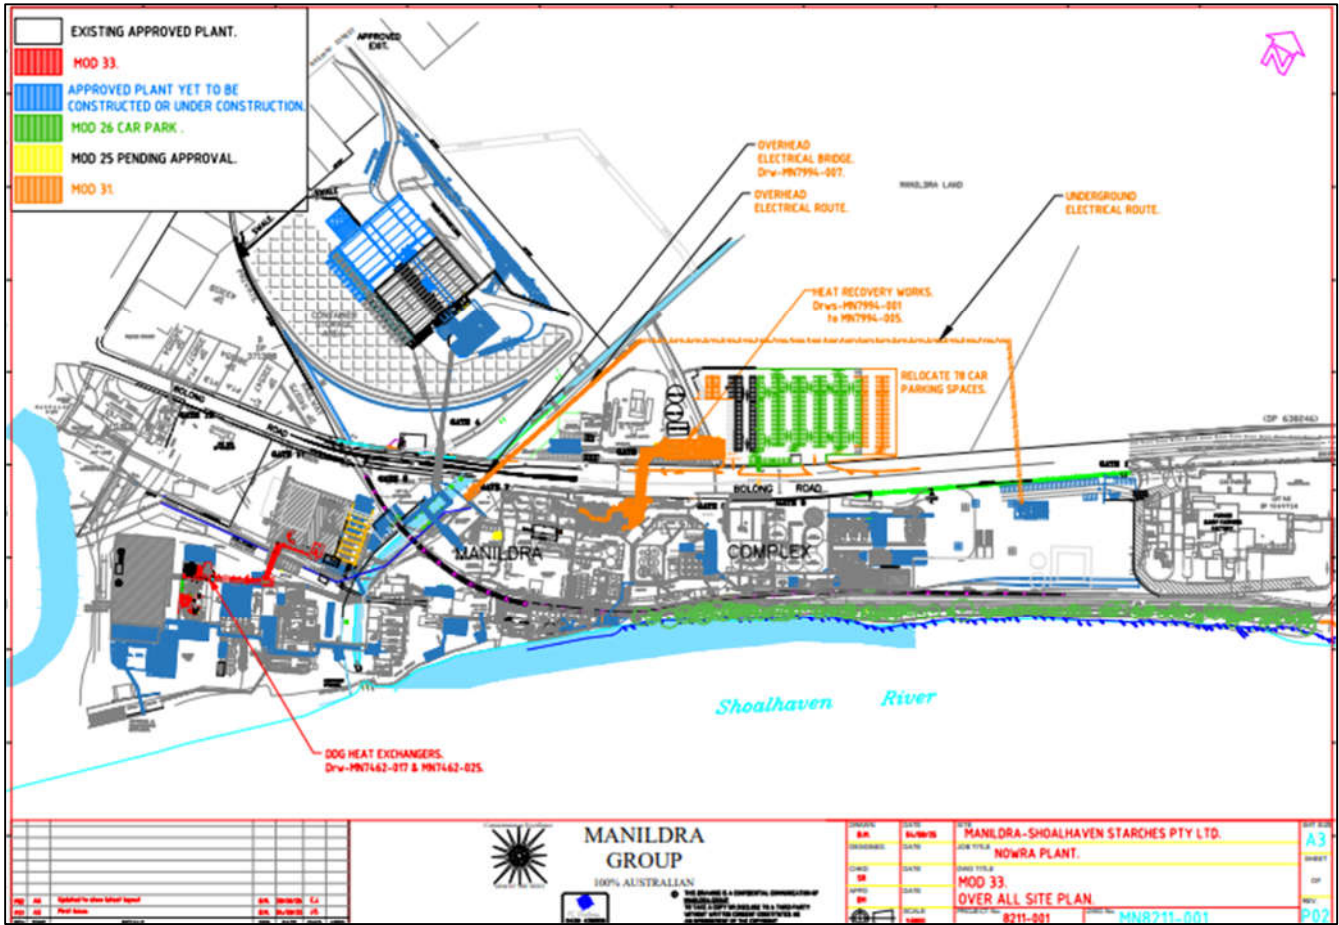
Modification Proposal Site Layout Source: Shoalhaven Starches
